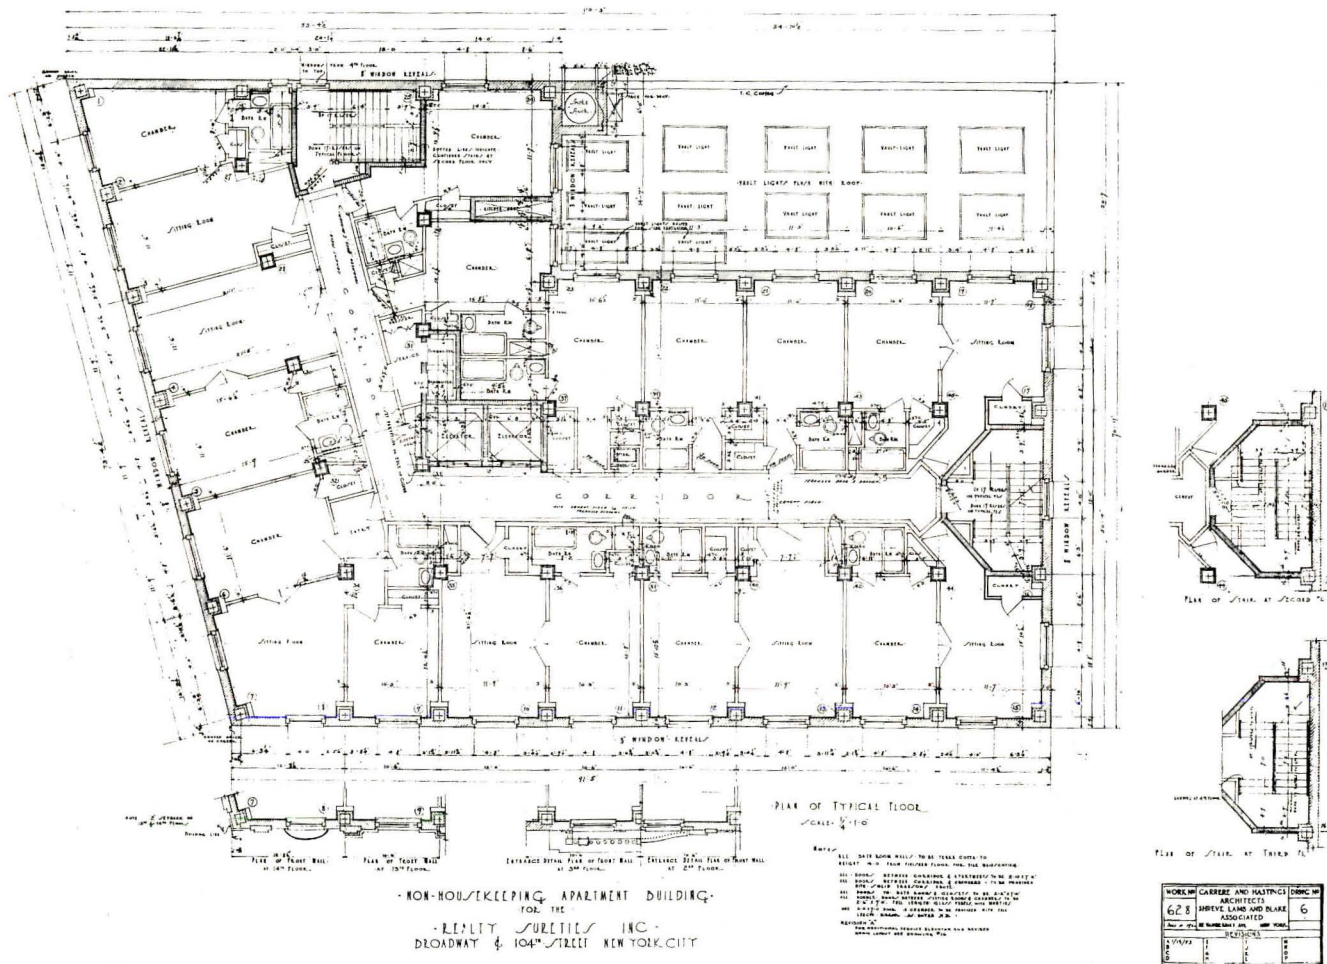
Plan of Typical Floor of Non-housekeeping Apartment Building for Realty Sureties, Inc., New York City. Carrere & Hastings, Architects. Shreve, Lamb & Blake, Associated.
